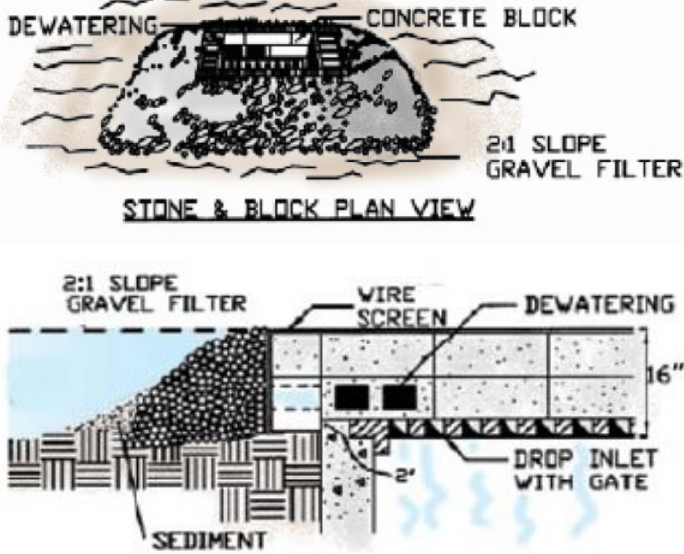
Schematic drawing of stone and block drop inlet protection showing dewatering holes. .
